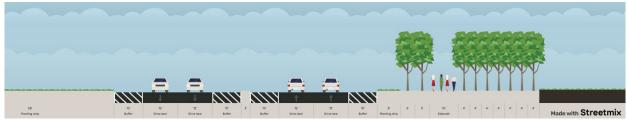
IL-116 looking SW near Maple Ln (proposed approximate cross-section)
